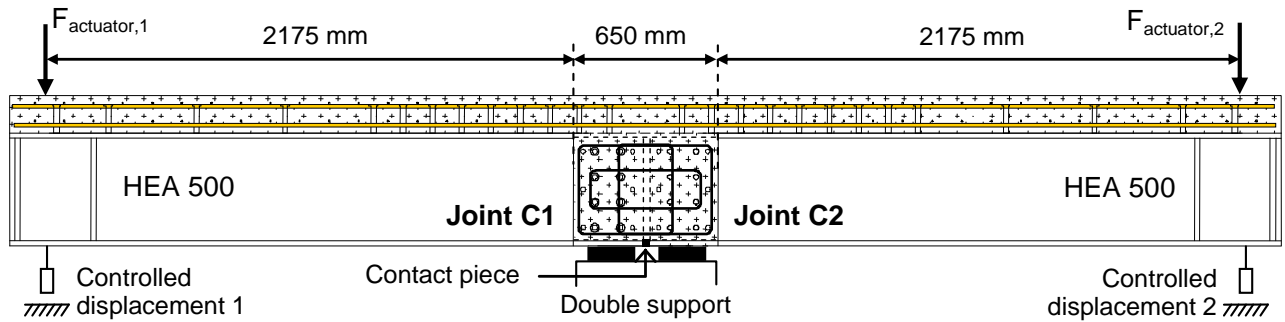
Beam-to-beam joint specimen with concrete embedding
